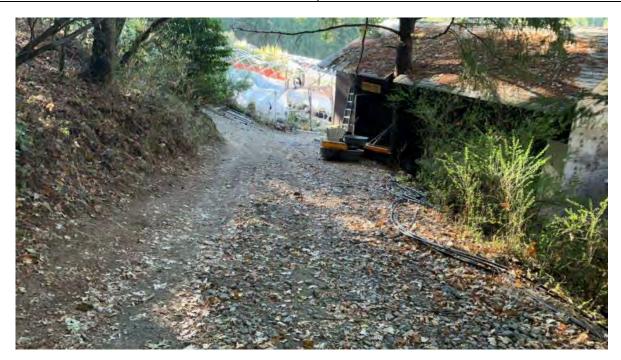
Driveway to CA2 is steep and lacks drainage; stormwater runoff is concentrated into the cultivation and storage area.
